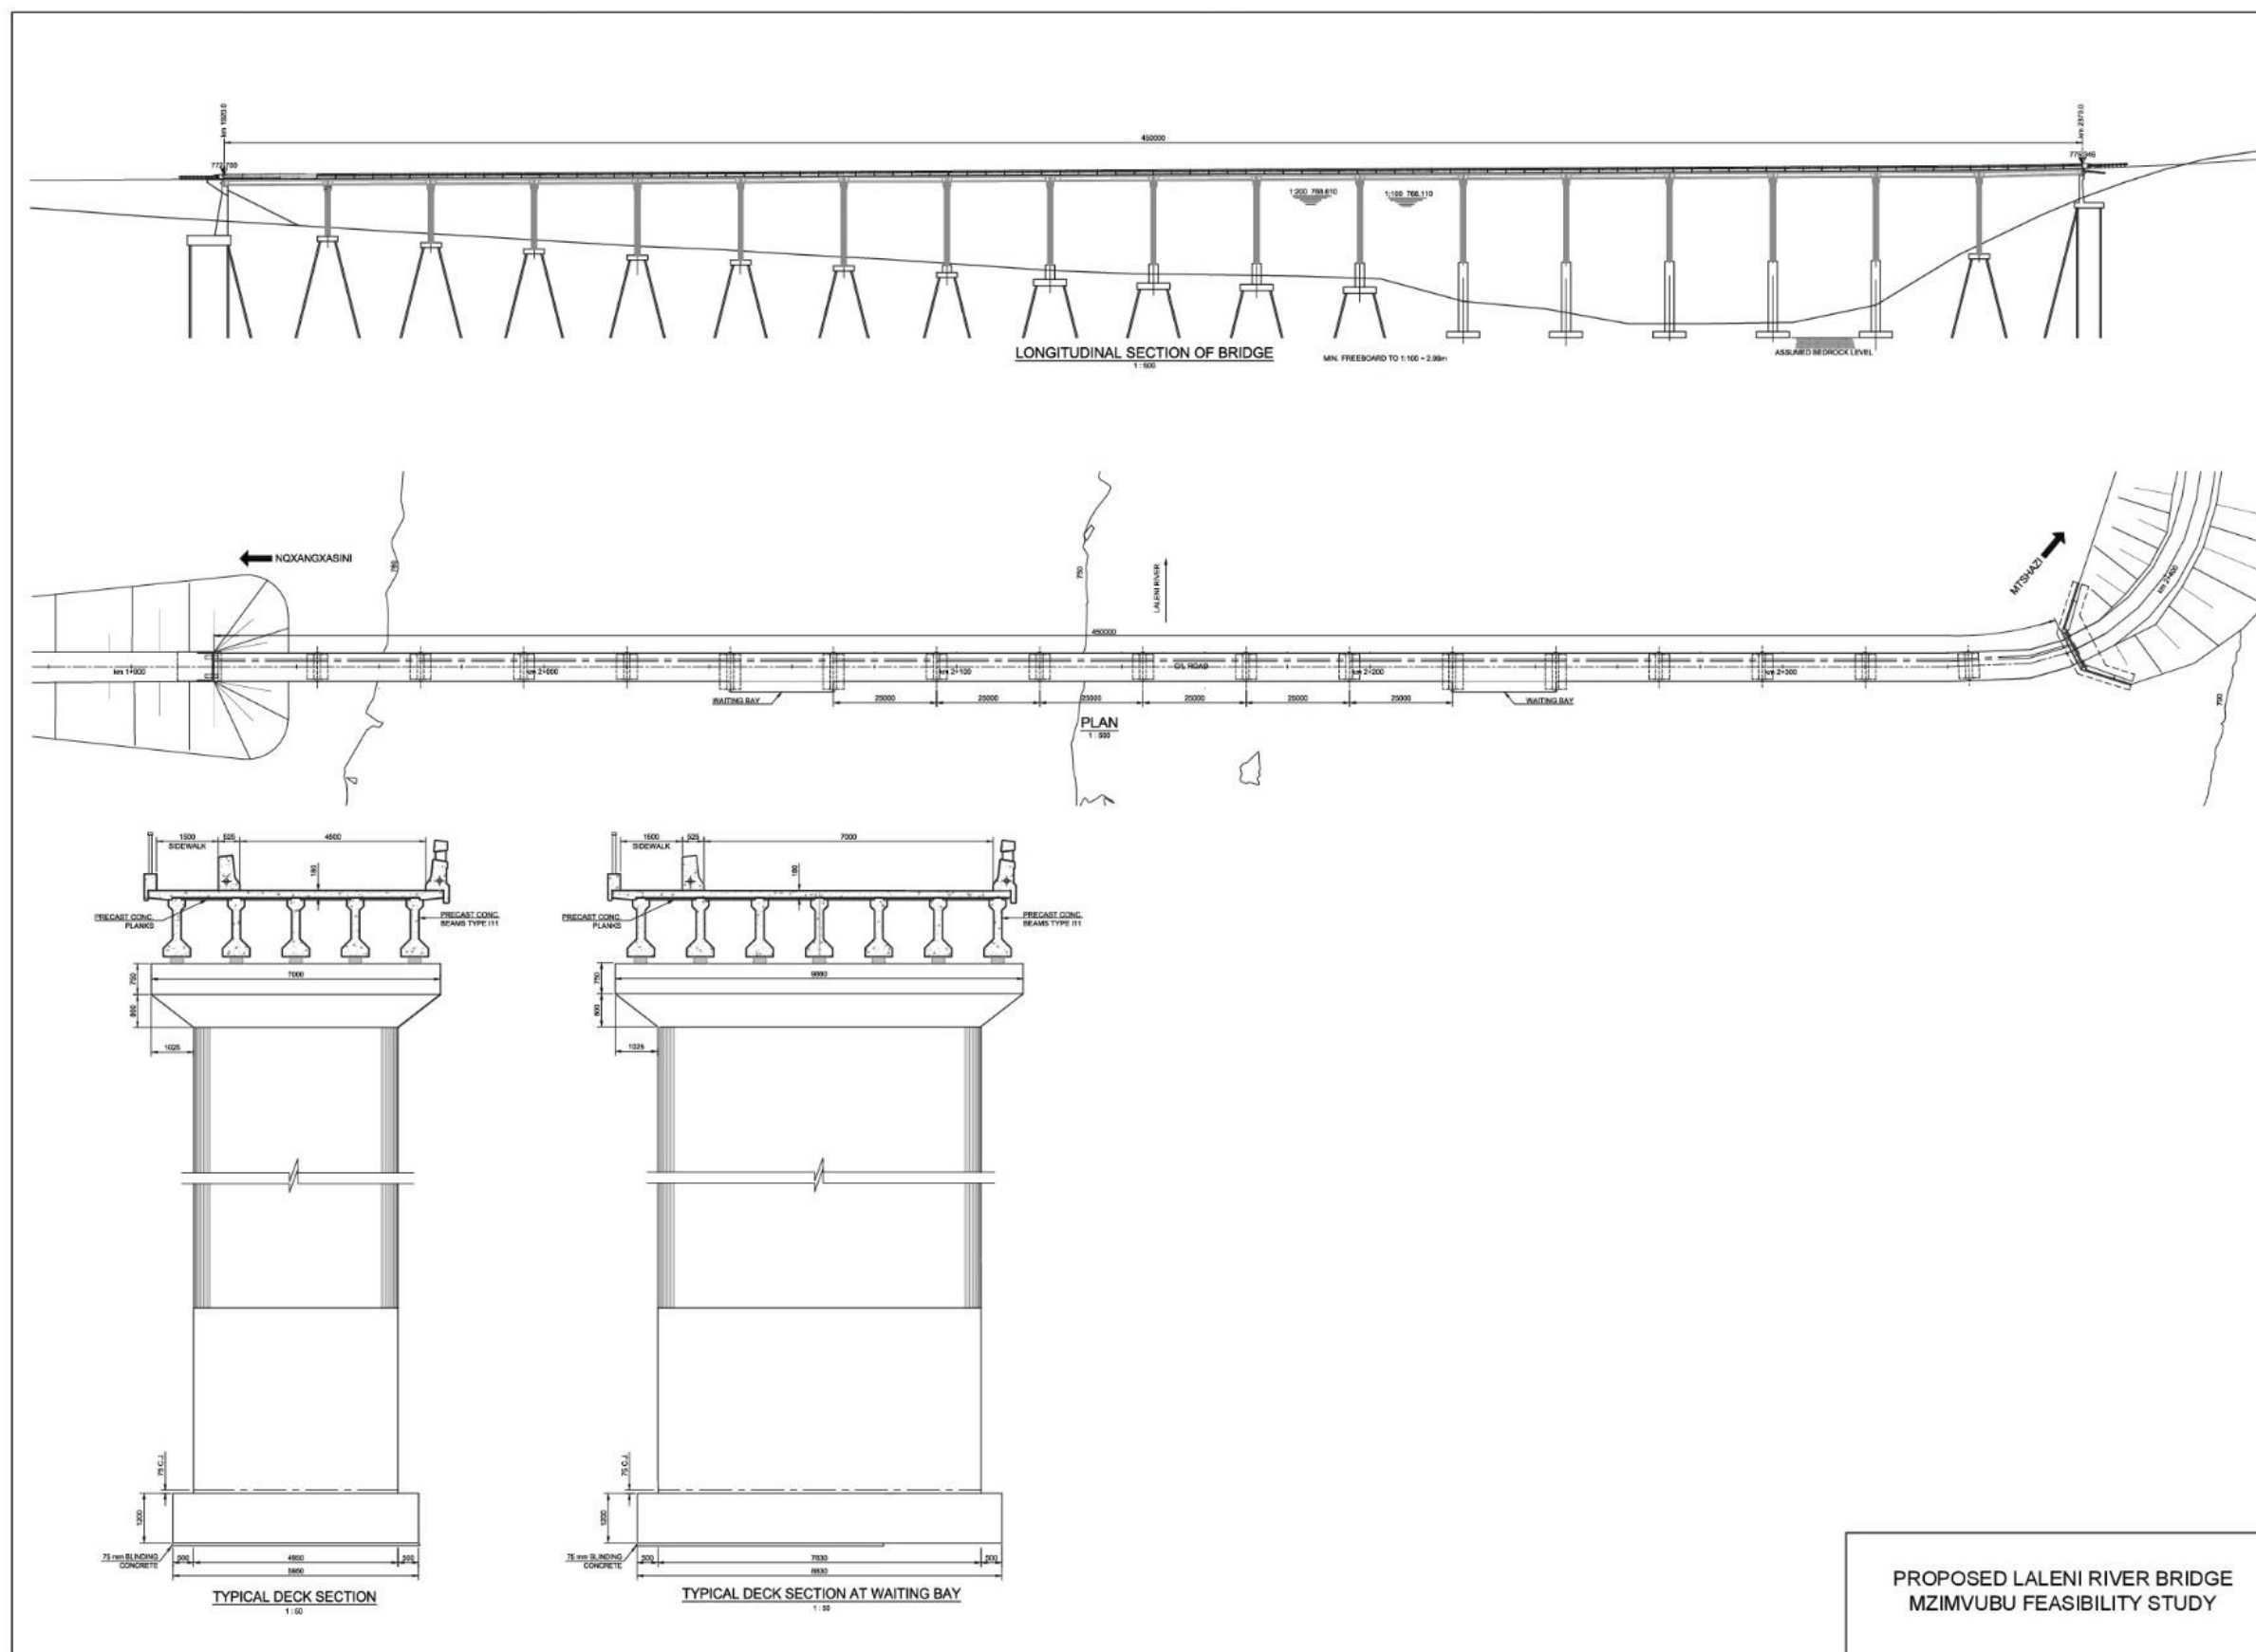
Proposed Laleni Bridge over Inundated River Section
